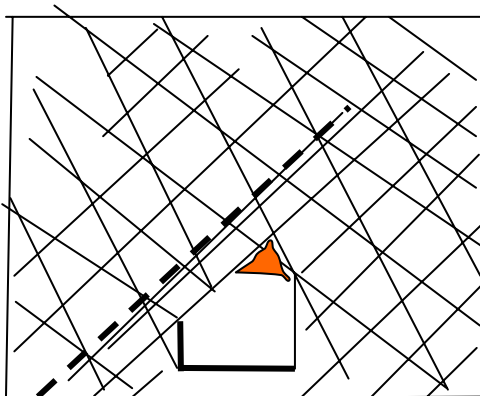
Shanty back mining to reduce Size of potential wedge in the roof
